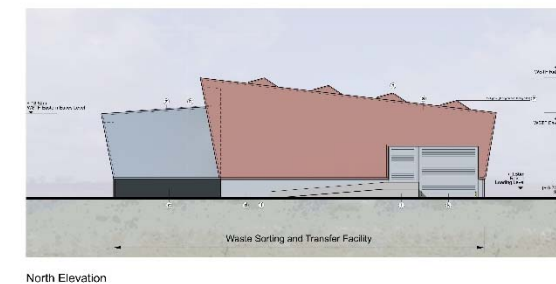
Proposed WSTF elevations – extract from drawings PL305 & 306
